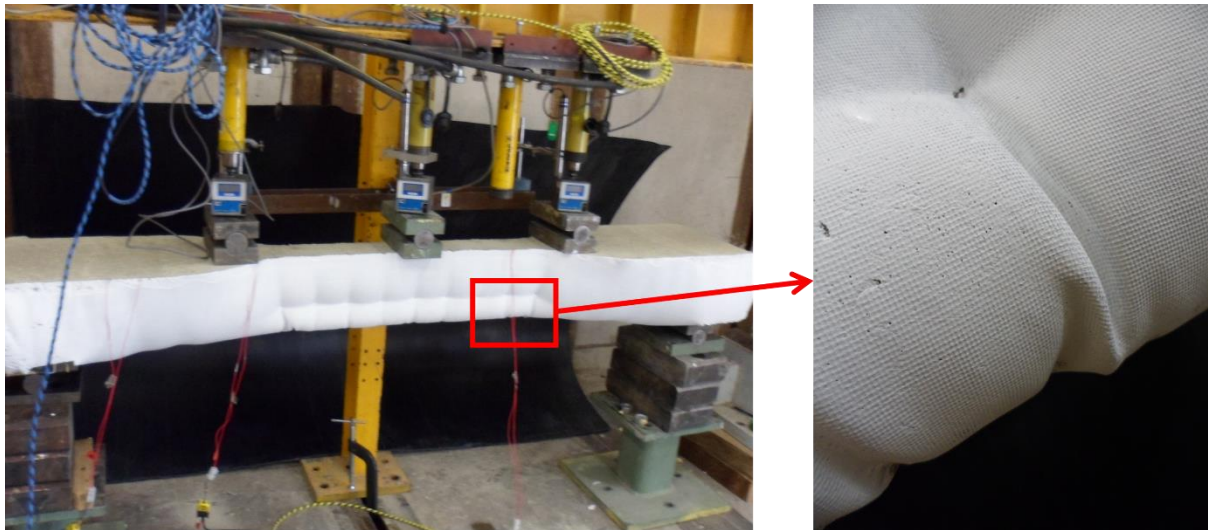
Undesirable fabric wrinkling in tensile reinforcement cover zone
